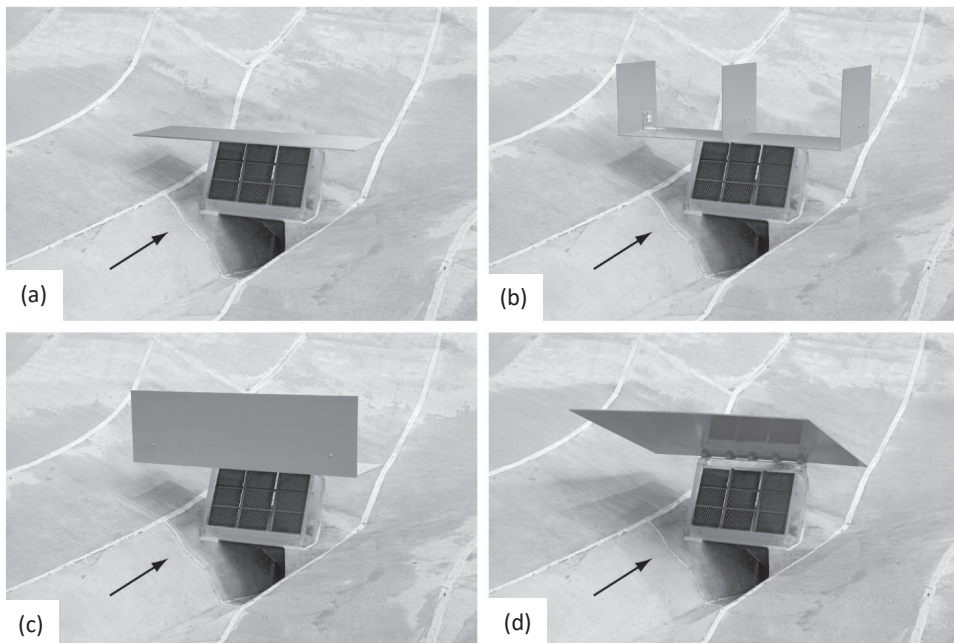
| Views showing a trial set of intake vortex suppression methods by cantilevered structures on top of an existing intake (view in flow direction): (a) horizontal cantilever slab; (b) horizontal cantilever slab with three vertical walls parallel to the axis of the intake structure; (c) L-shaped roof slab; and (d) pitched roof slab at an angle of 22° to the horizontal, perpendicular to the trash rack plane, extending up to the reservoir drawdown level (from Möller et al., 2010).
